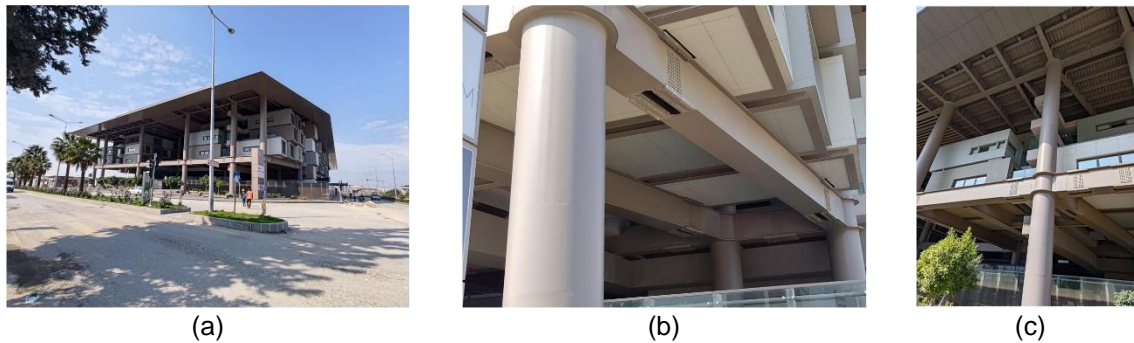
(a) A steel building, (b) splices of beam segments, (c) a beam-column joint.
